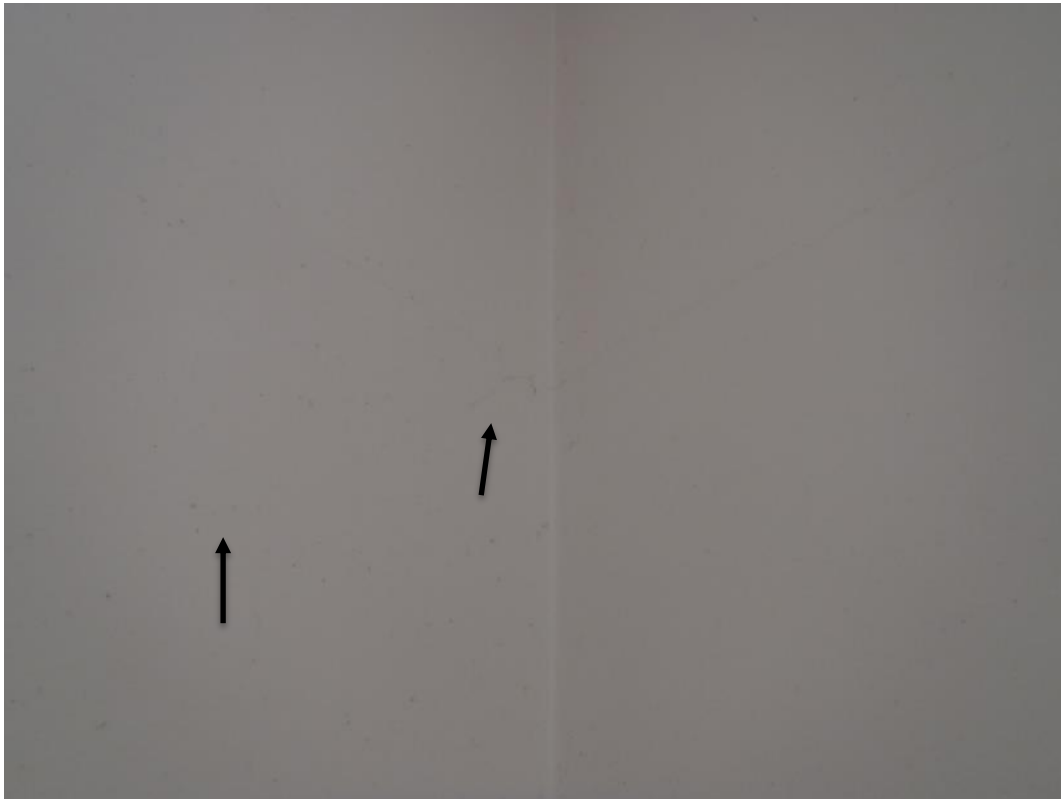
shows evidence of a previous repair and flaking paint to the plaster ceiling lining in the Kitchen.
